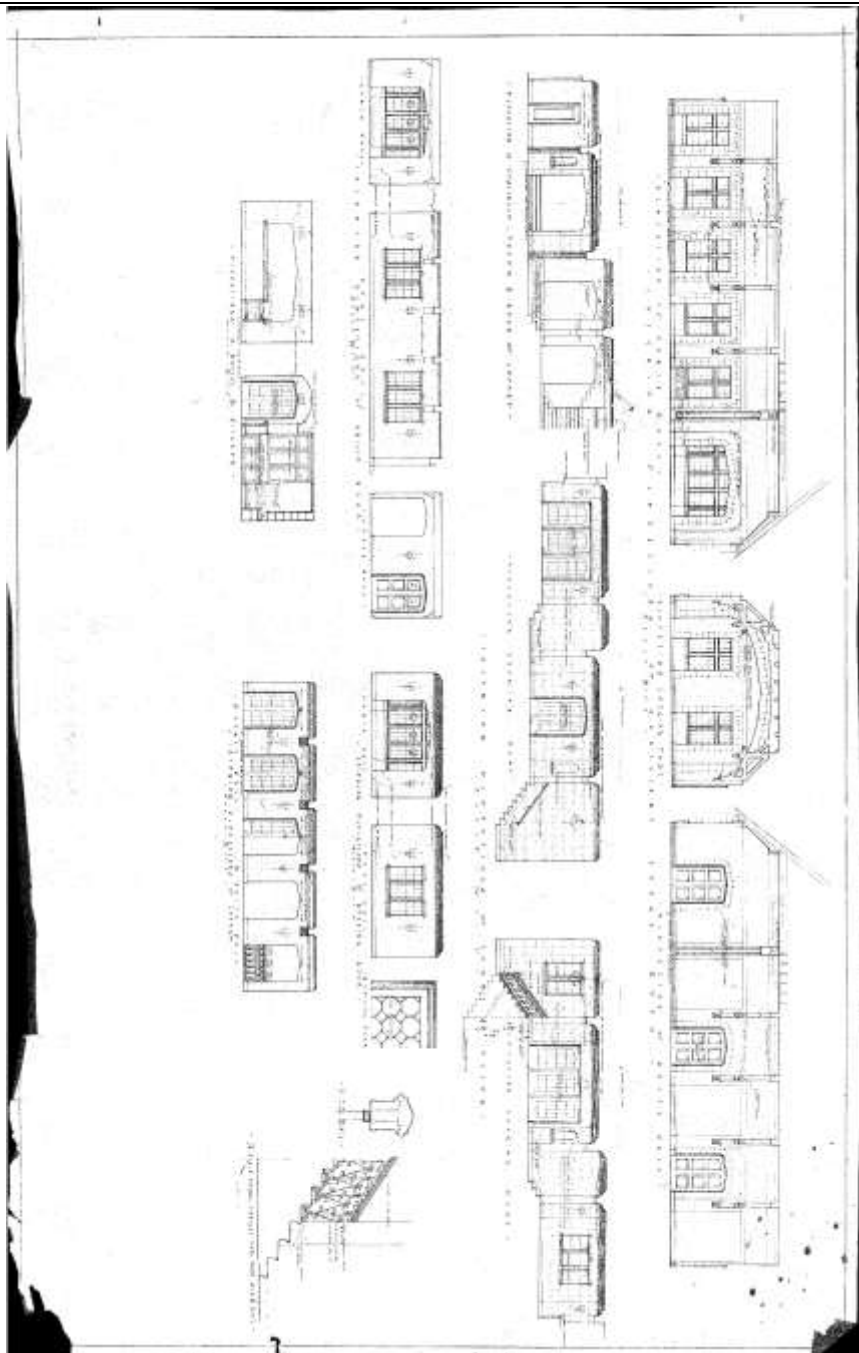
Blueprint of Enlarged North elevation plan by architect Henry Auler
